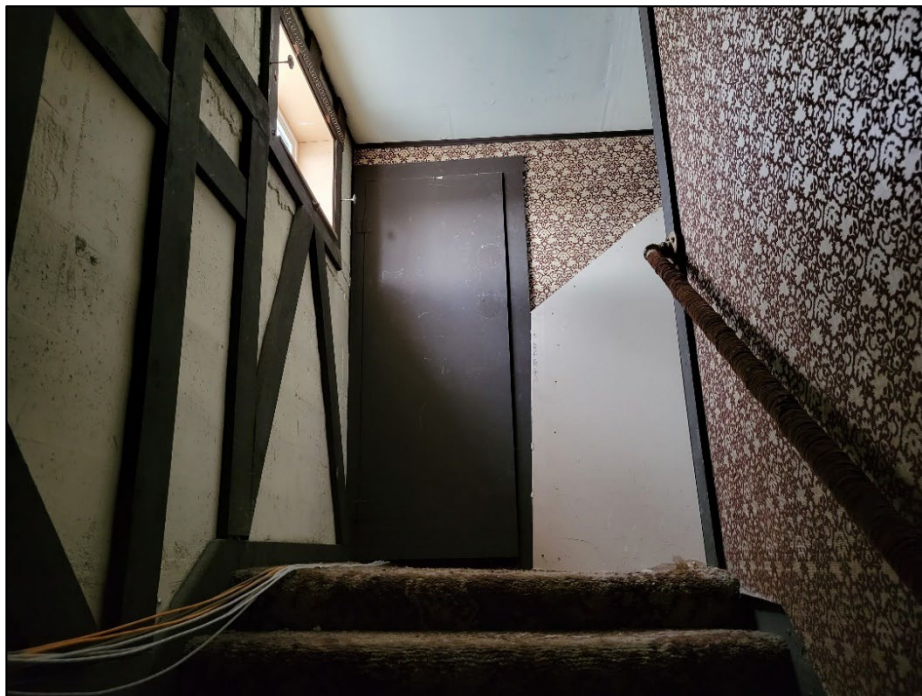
DW02: Drywall ceiling on the first floor containing 3% chrysotile ACM.
